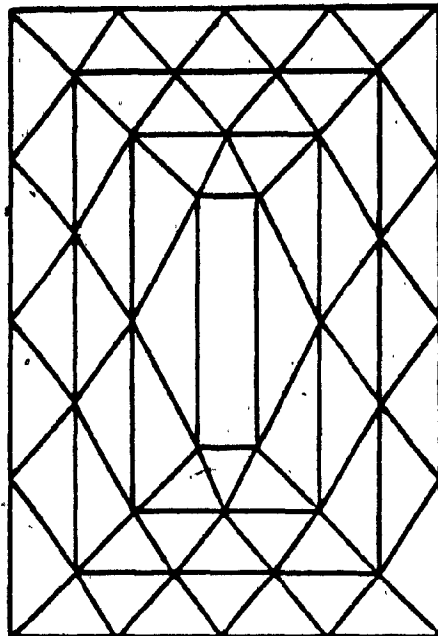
PLAN VIEW OF A RING TRUSS. THE TRUSS HAS FOUR EQUALLY SPACED SQUARE RINGS. NOTE THAT THE BRACING TRUSSES ARE NOT SHOWN.
